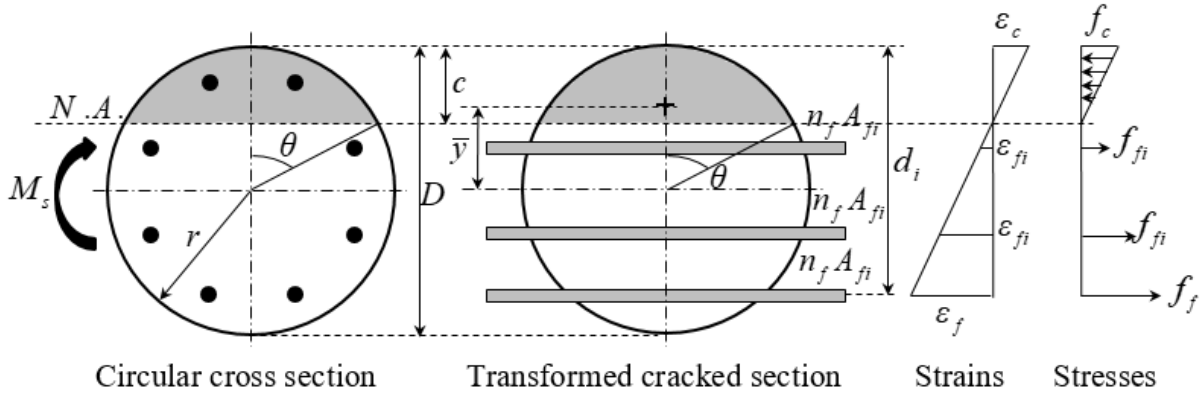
Transformed cracked section, strains, and stresses at service load.
